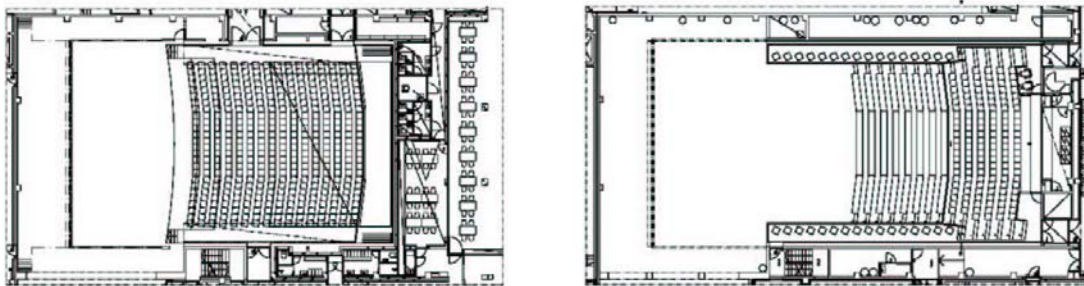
Plans of the Vanaja Hall, first and second floor
